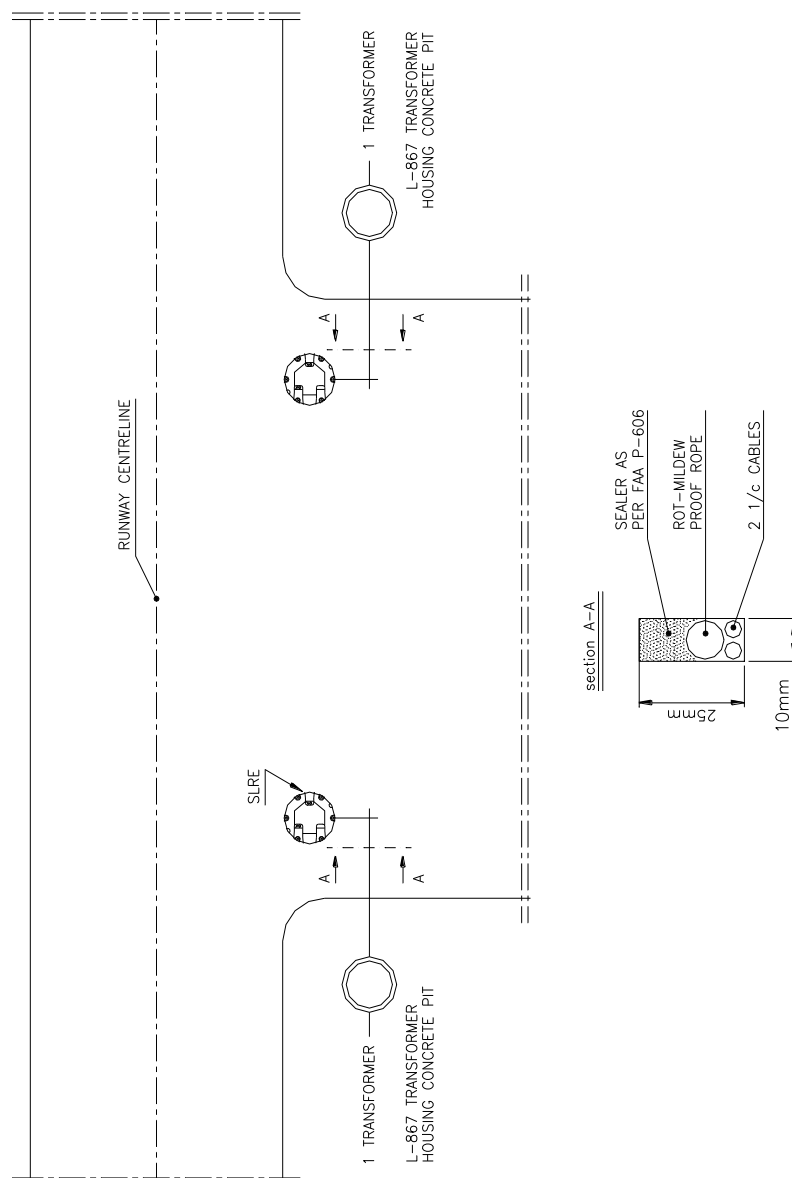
Example of runway edge configuration (one transformer per each fixture)
